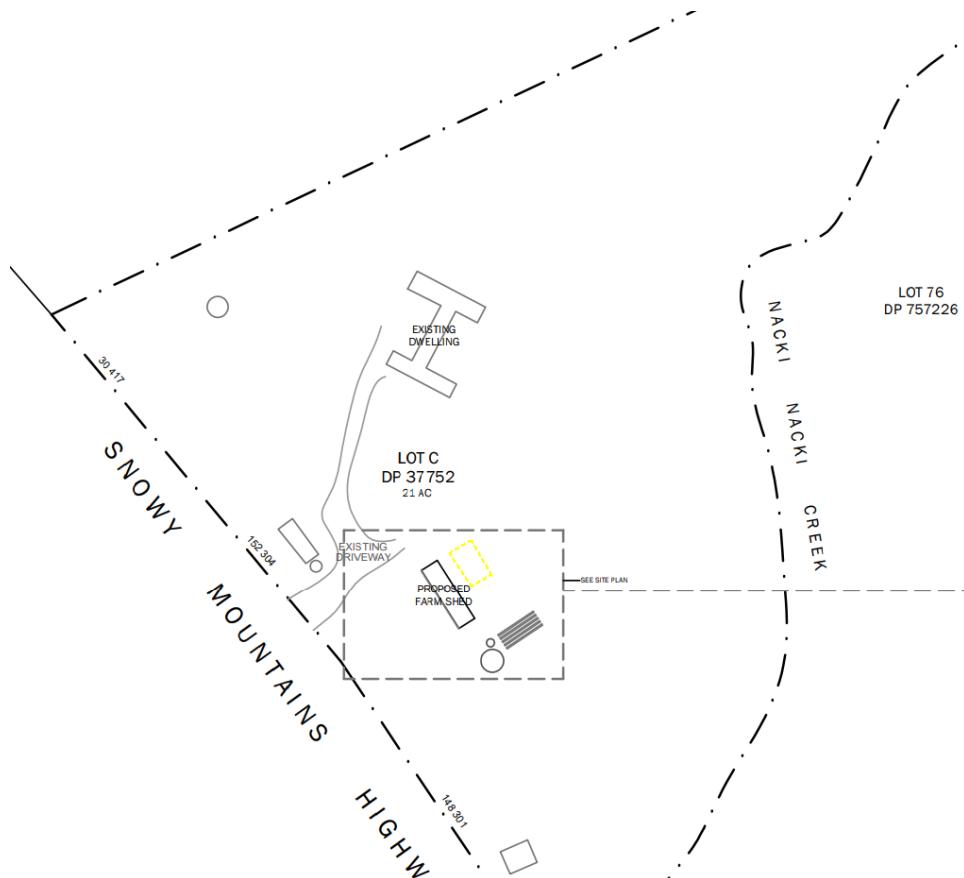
Proposed location of new farm building (Source: extract submitted plans)
